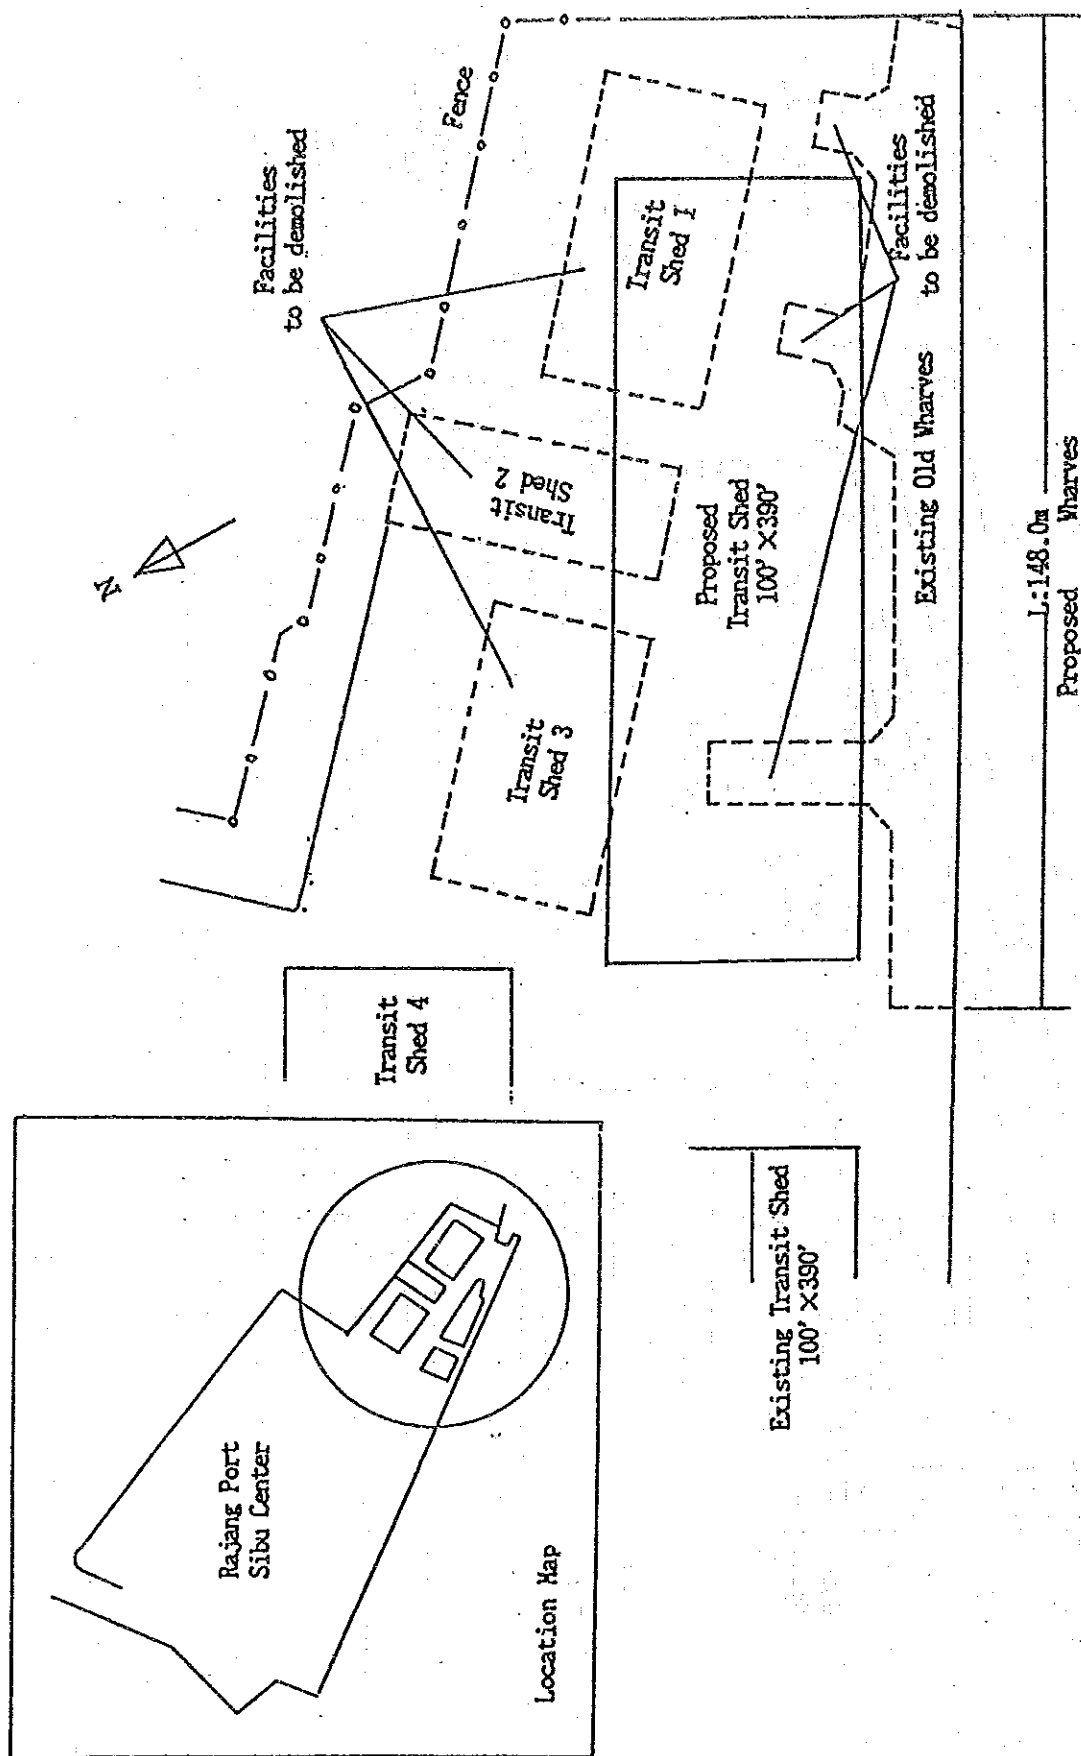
Renovation Plan of Rajang Port at Sibu Center
